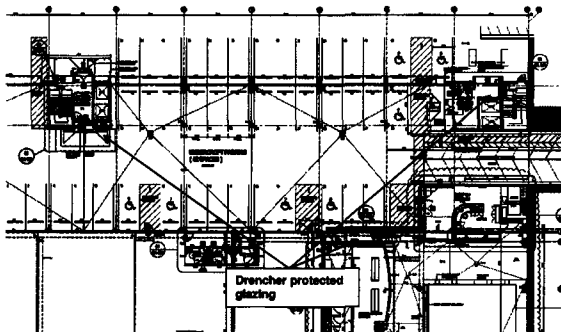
Location of proposed drencher protected glazing and fire separation on Ground Floor
